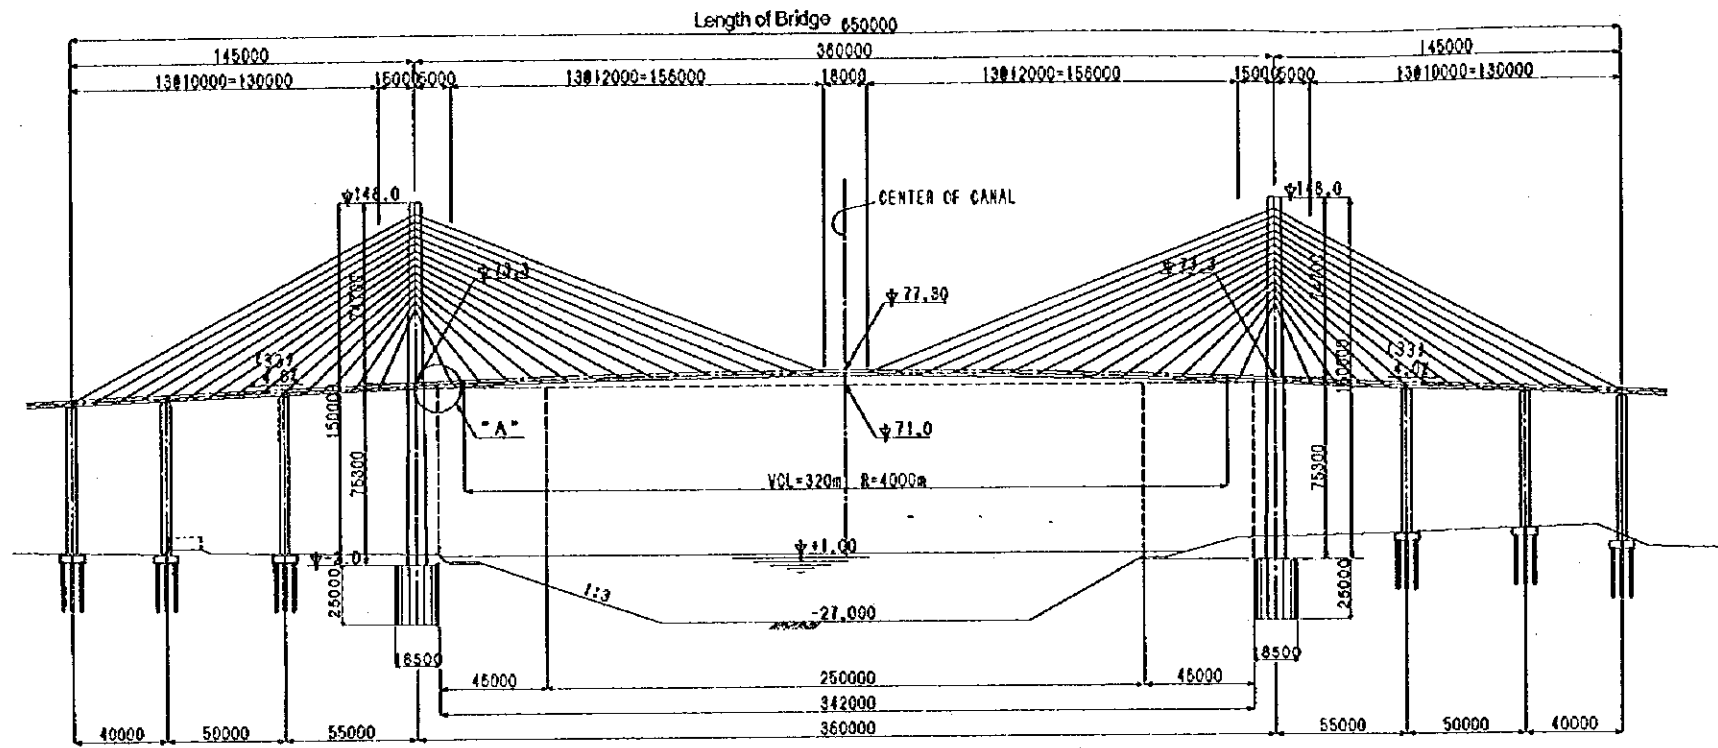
General View (2 Lane Steel Box Girder Alternative L=353m)
